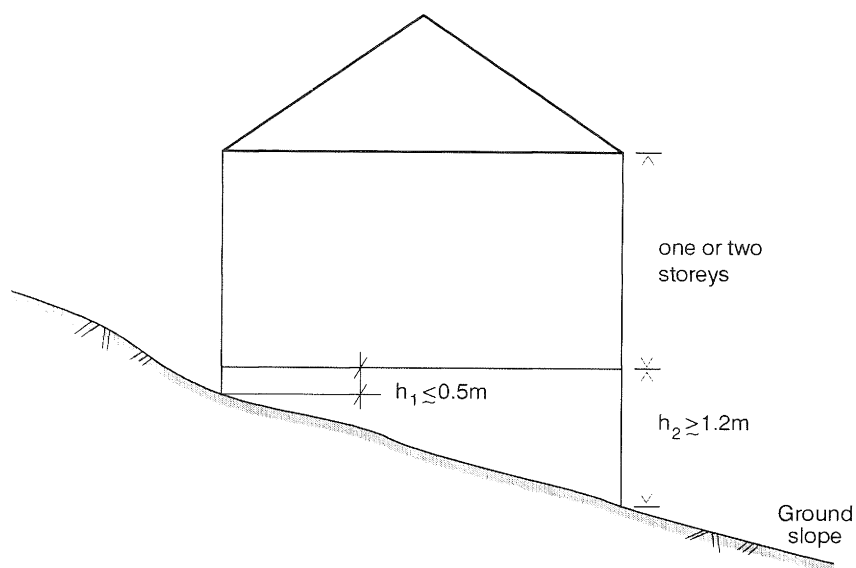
Geometry of “hybrid” foundation type for weatherboard houses, the piles of which were found to be effectively braced, and equivalent to concrete perimeter wall foundations.
